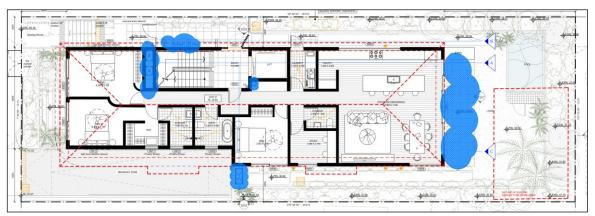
Proposed ground floor plan (source: Common Office, dated 29/05/2025)
